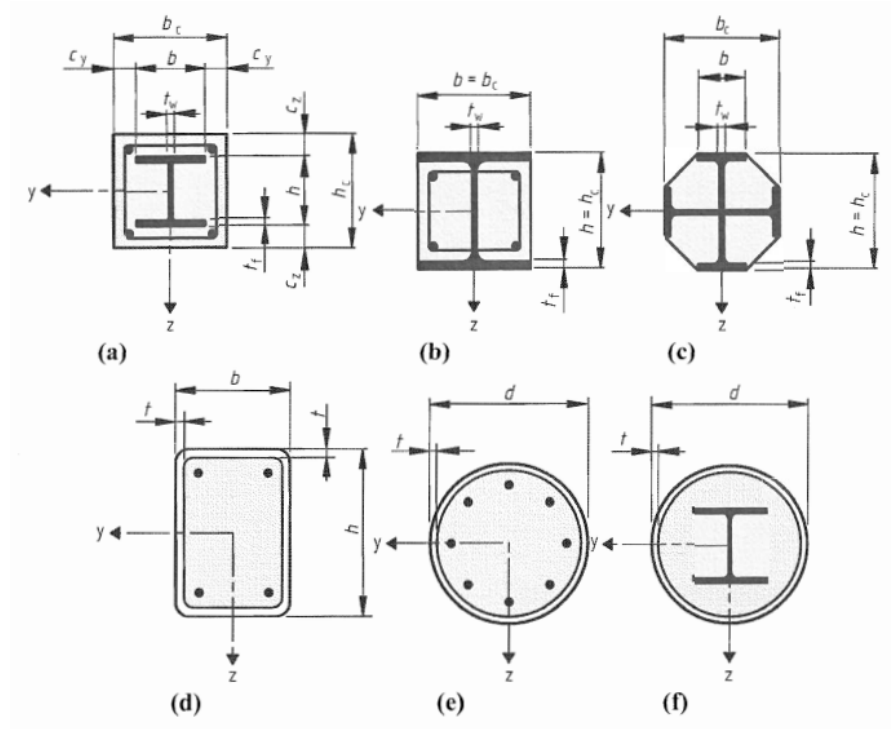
Typical cross-sections of composite columns and notation, [12]
